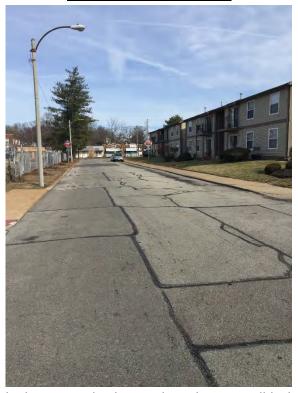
Westgate Avenue looking towards Olive Boulevard. New midblock crossing to be constructed where the left sidewalk terminates.
